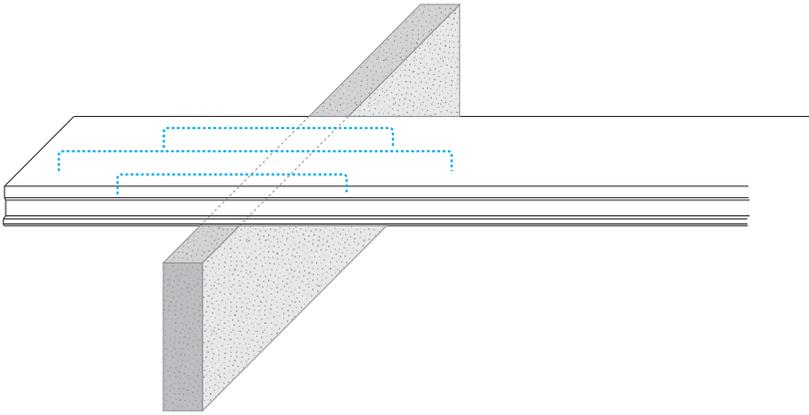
Example of longitudinal reinforcement inserted manually in the still-fresh hollow core slab in correspondence to a support with a heavily loaded cantilever
